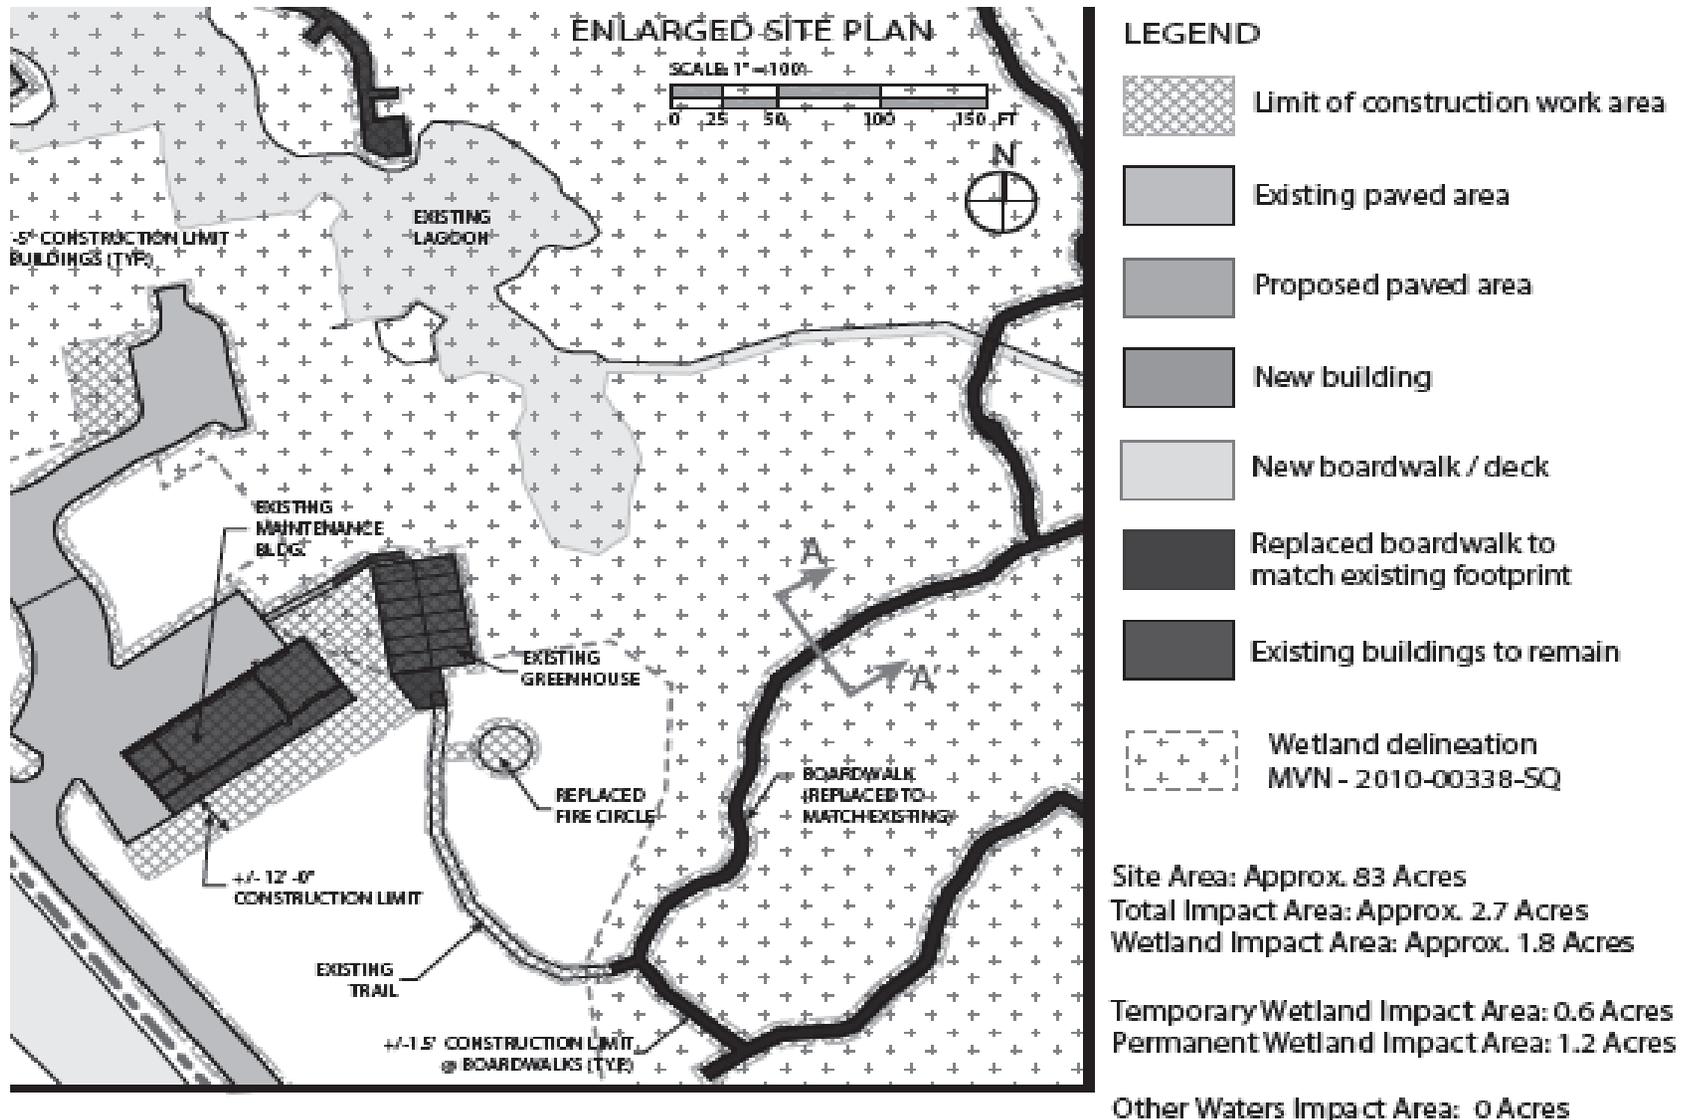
Site of ANC, showing the proposed building removal and two existing buildings to remain.
